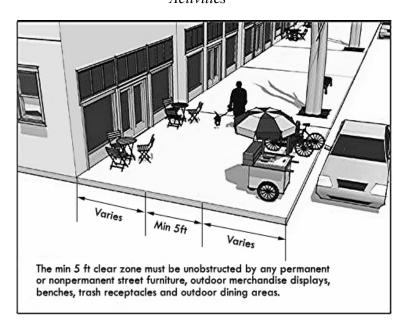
A.1: OUTDOOR EATING AREAS
